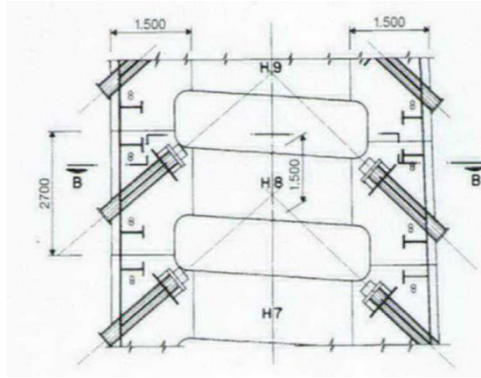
Steel anchorage box used for anchorage of the cables at the pylon [18]
